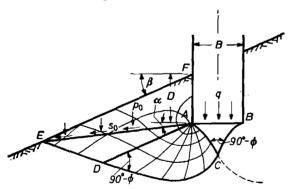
Plastic zones near rough strip foundation on face of slope (foundation failure)
